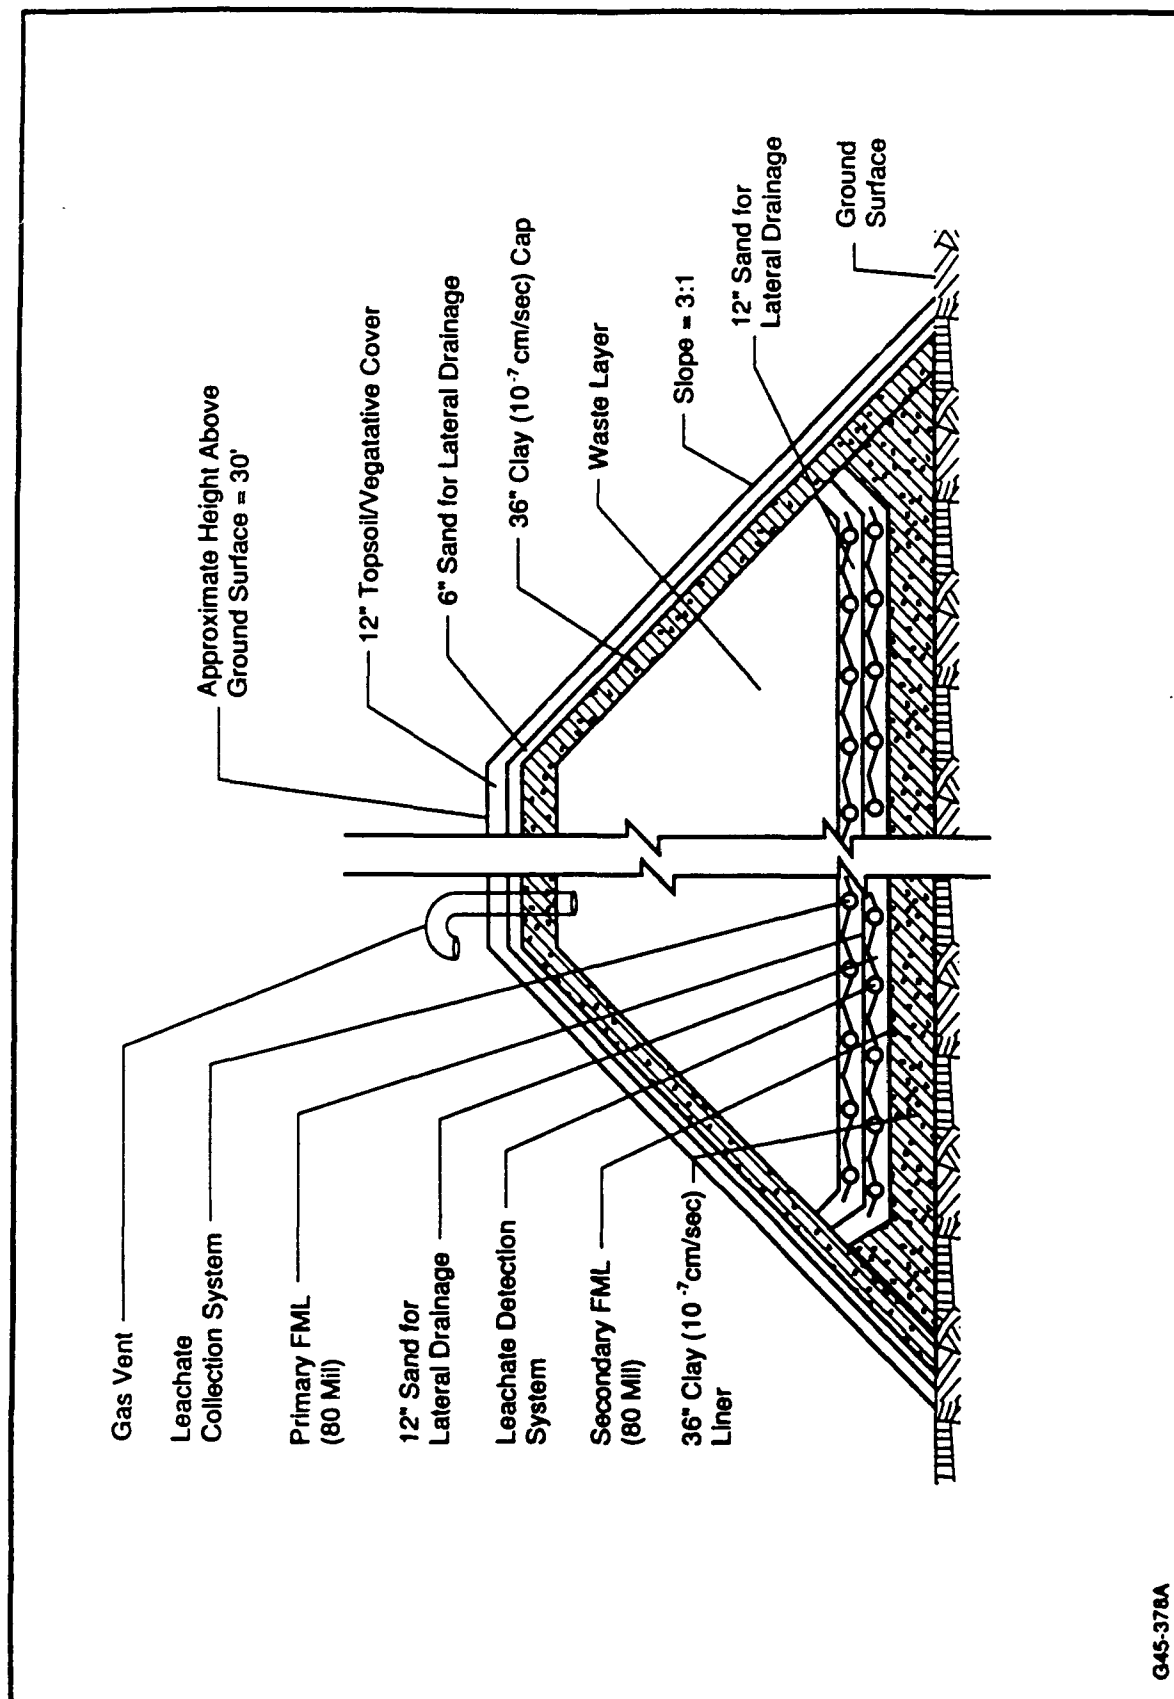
DOUBLE-LINED CONSOLIDATION/CONTAINMENT UNIT - CONCEPTUAL CROSS-SECTION
